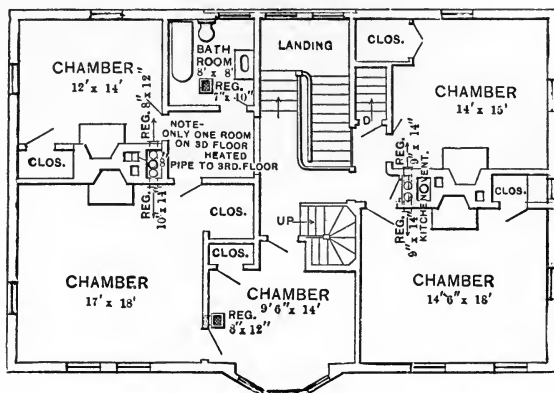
Second-Floor Plan (9' 0") of a Residence Heated by a Furnace System.
